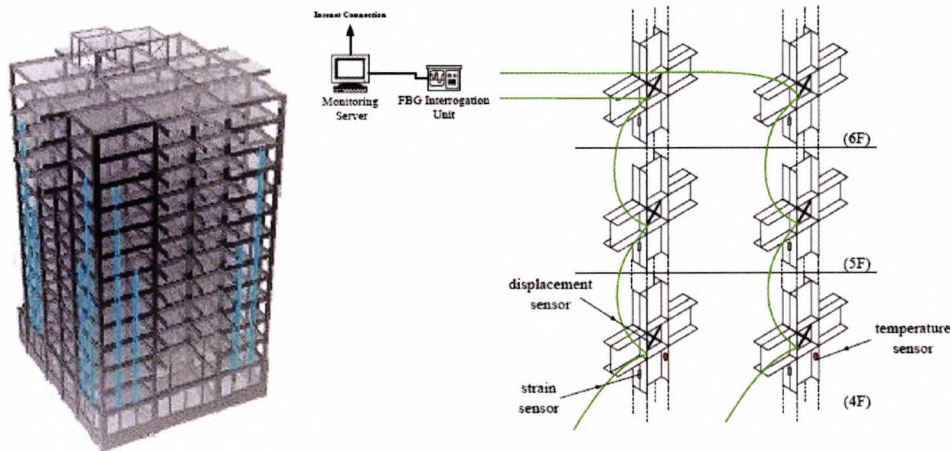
Illustration of the 12-story steel building structure and the layout of the SHM system installed onto the building structure. [40]
